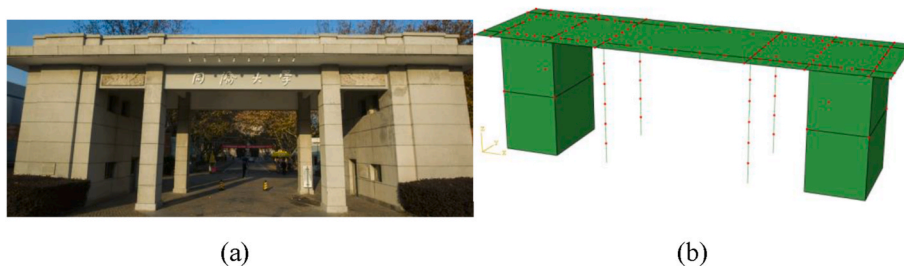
The single-story reinforced concrete structure. (a) Shows the photo of the single-story reinforced concrete structure; (b) shows the finite element model of the single-story reinforced concrete structure and selected nodes.
